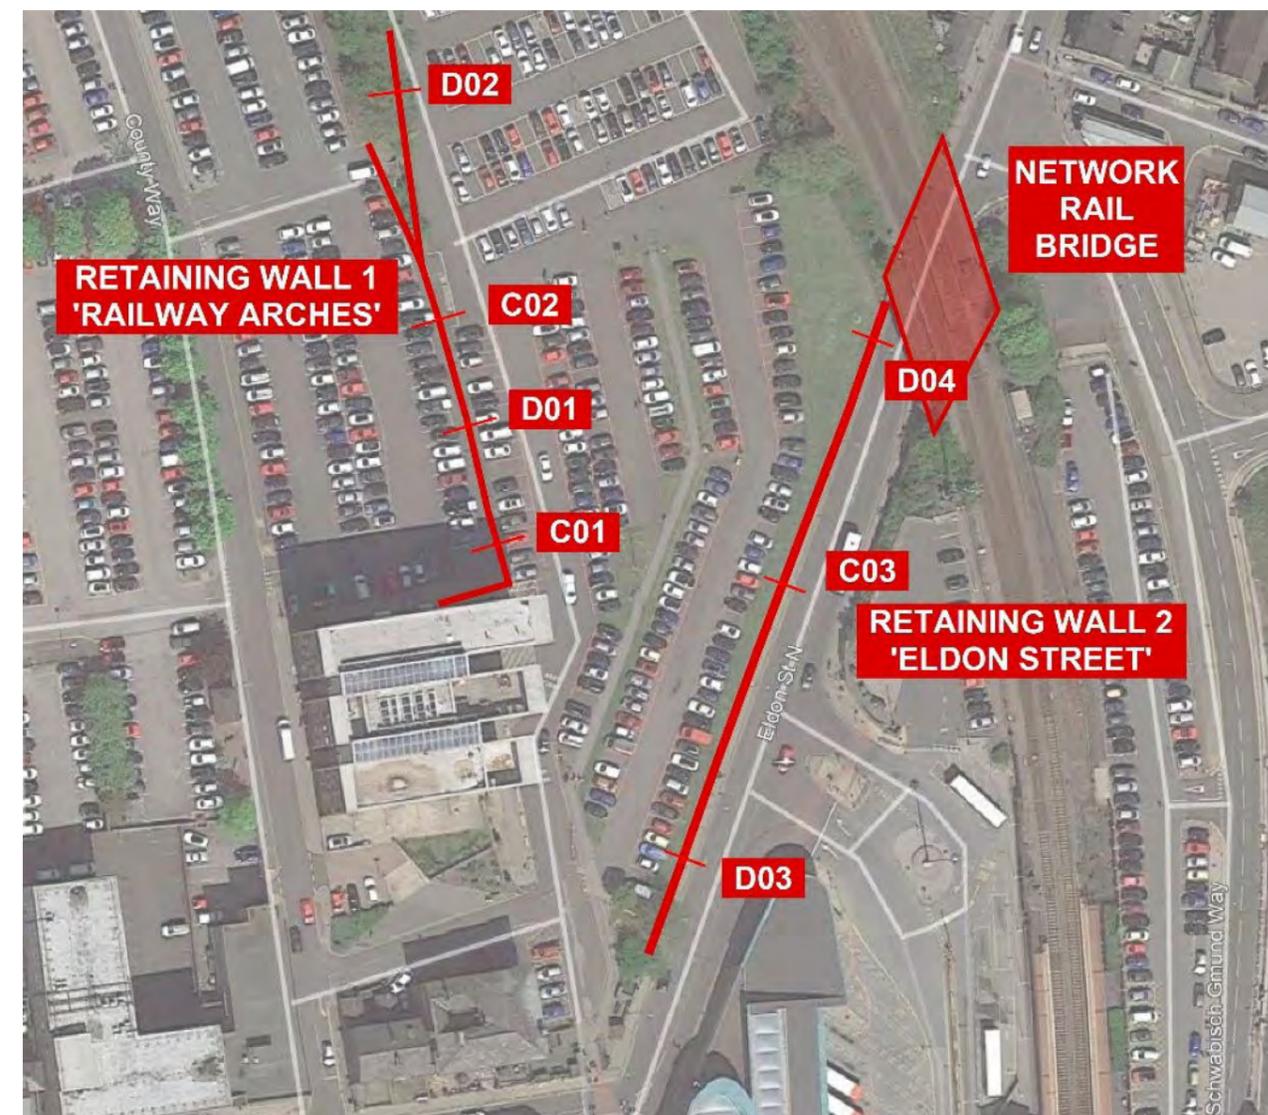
Proposed retaining walls survey extents and core ("C") and drill ("D") locations.
